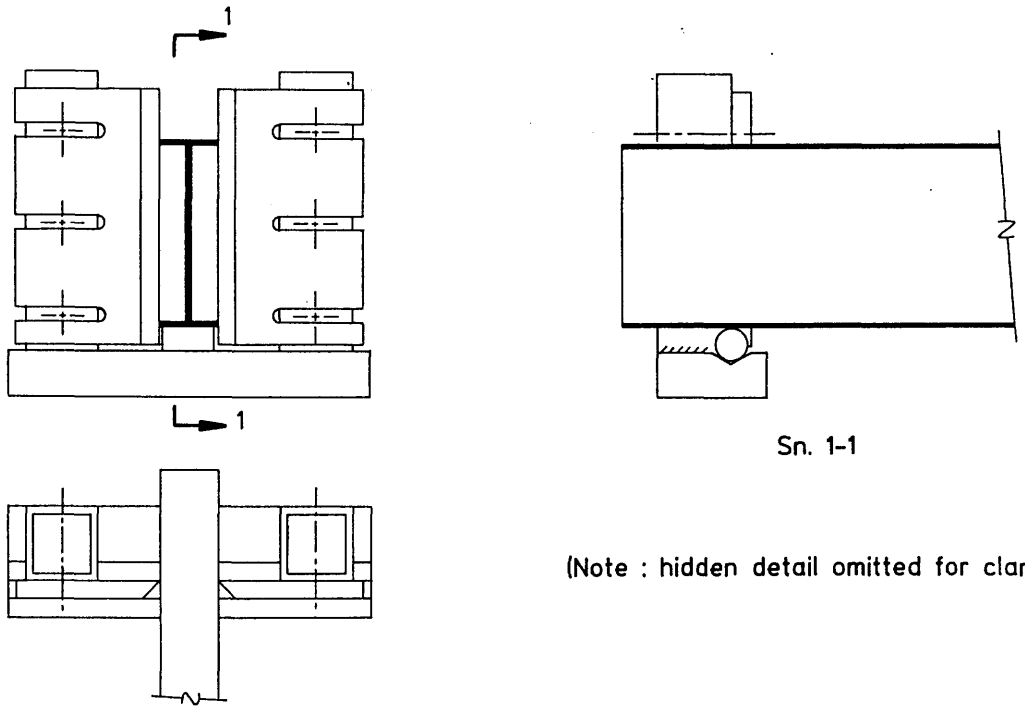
Details of one end support frame for model beams. Similar frame (incorporating roller to permit longitudinal movement) at other end
